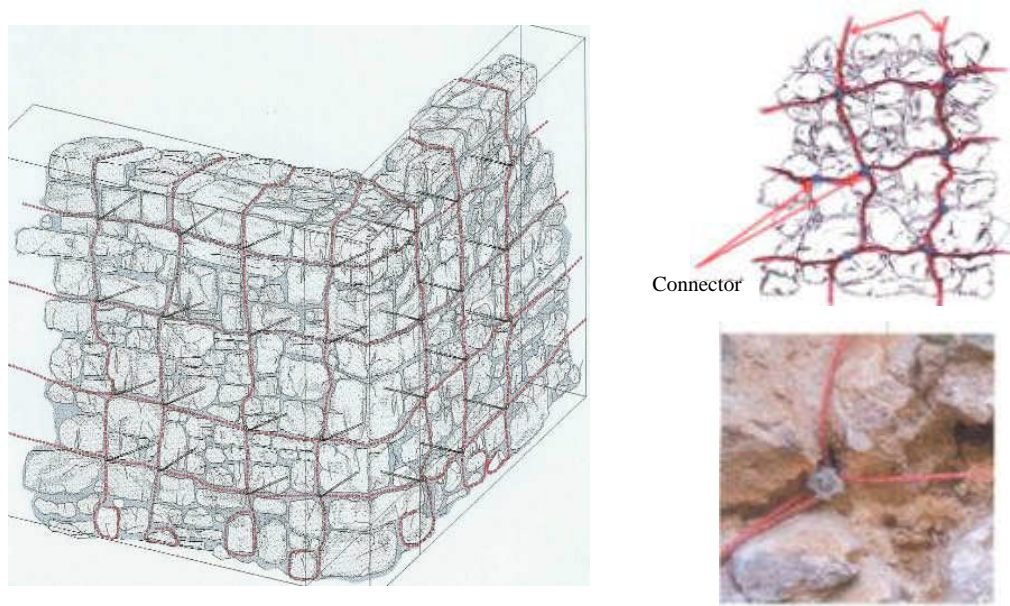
Masonry strengthening technique with a net of GFRP wires or stainless steel strands: axonometric view and details.
